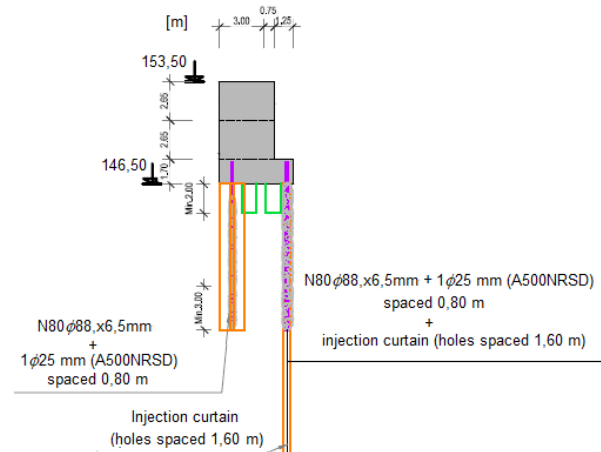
Wall geometry and foundation solution adopted for right abutment of the cofferdam (adapted from Pinto et al., (2014)).
